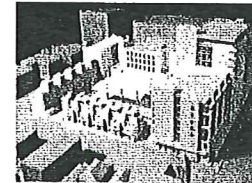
Mixed-use and townhouses along west side of South Hancock between East Washington Avenue and East Main Street.
